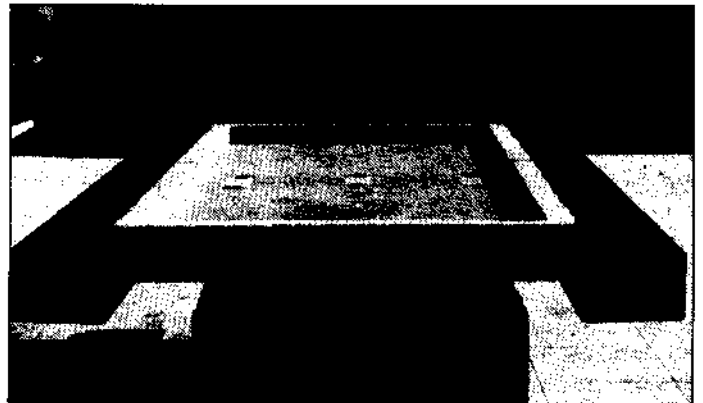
The cracked concrete slab with the "solar-boxes"
